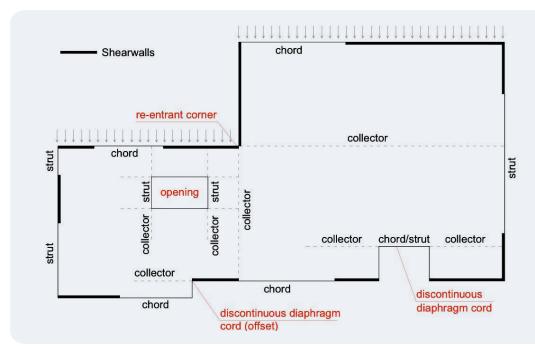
Irregular floor geometry with typical diaphragm elements.
